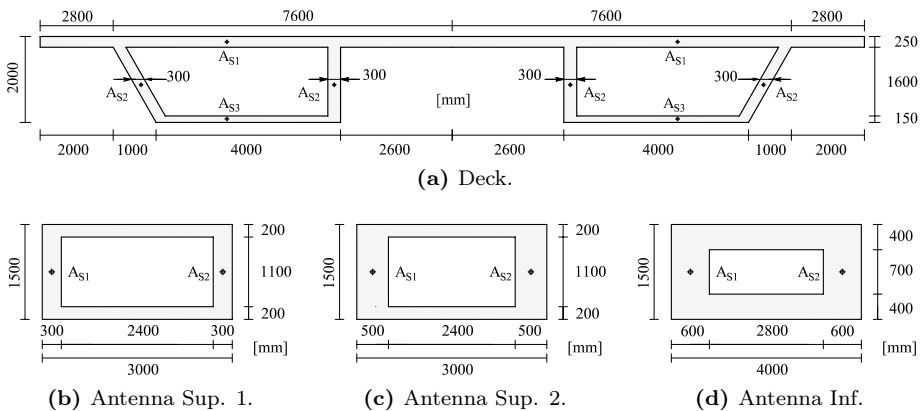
Cable Stayed Harp Bridge: geometry of the sections.
